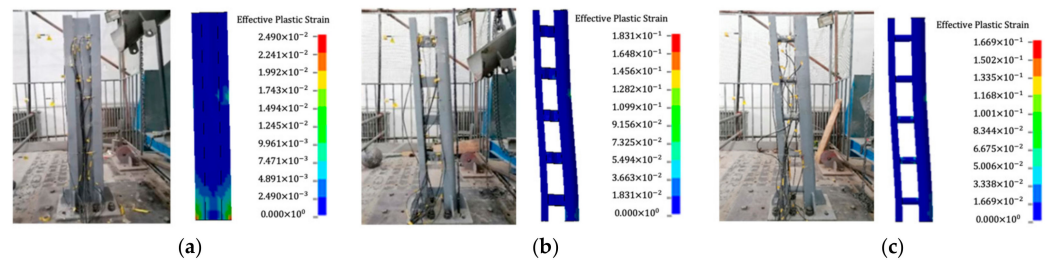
Overall bending deformation of columns. (a) tubular flange column; (b) special-shaped tube flange column I; (c) special-shaped tube flange column II.
